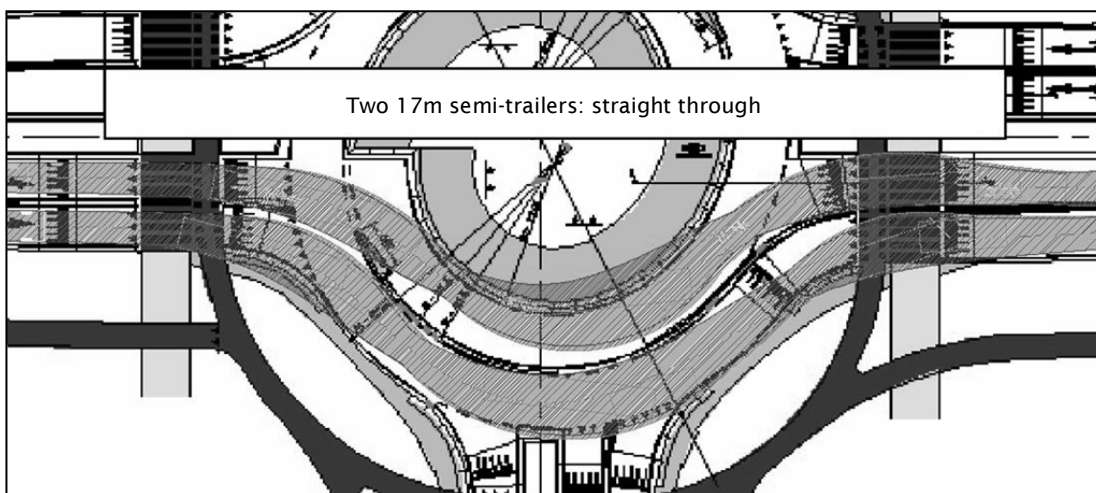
Swept path of the design 17m semi-trailer used in New Zealand when negotiating a turbo-roundabout built to Dutch dimensions (left-hand drive layout): straight through
